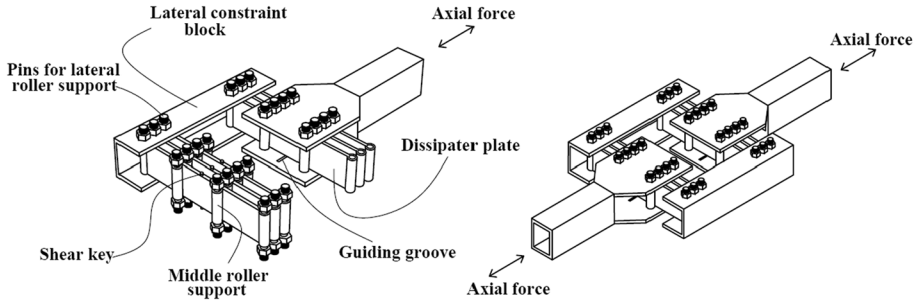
PBYD details for transforming axial force to pure bending in dissipater plates
